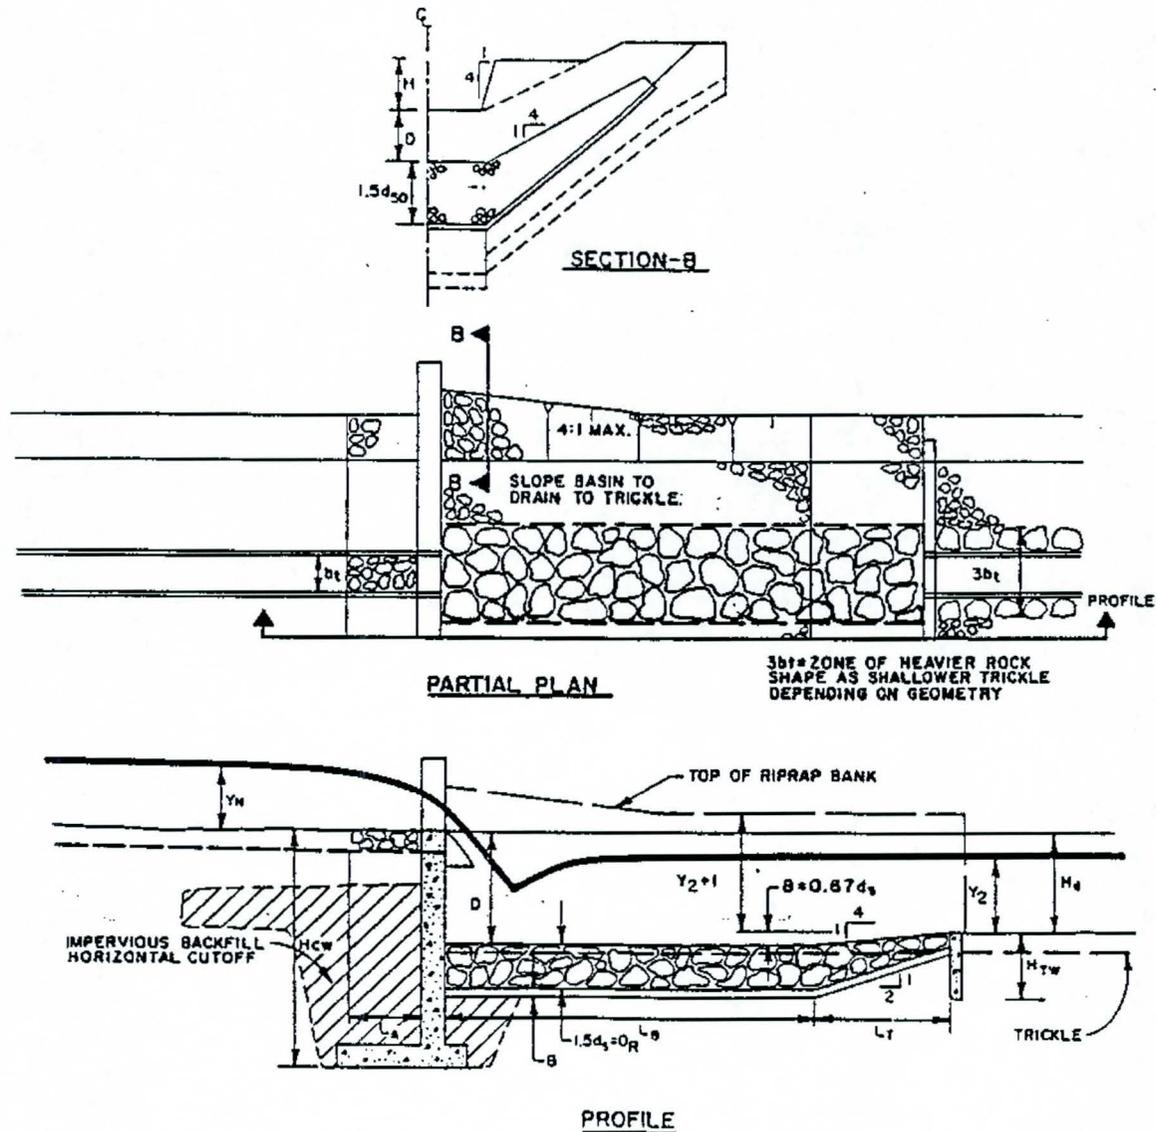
Details of vertical riprap drop (after McLaughlin Water Engineers 1986).
